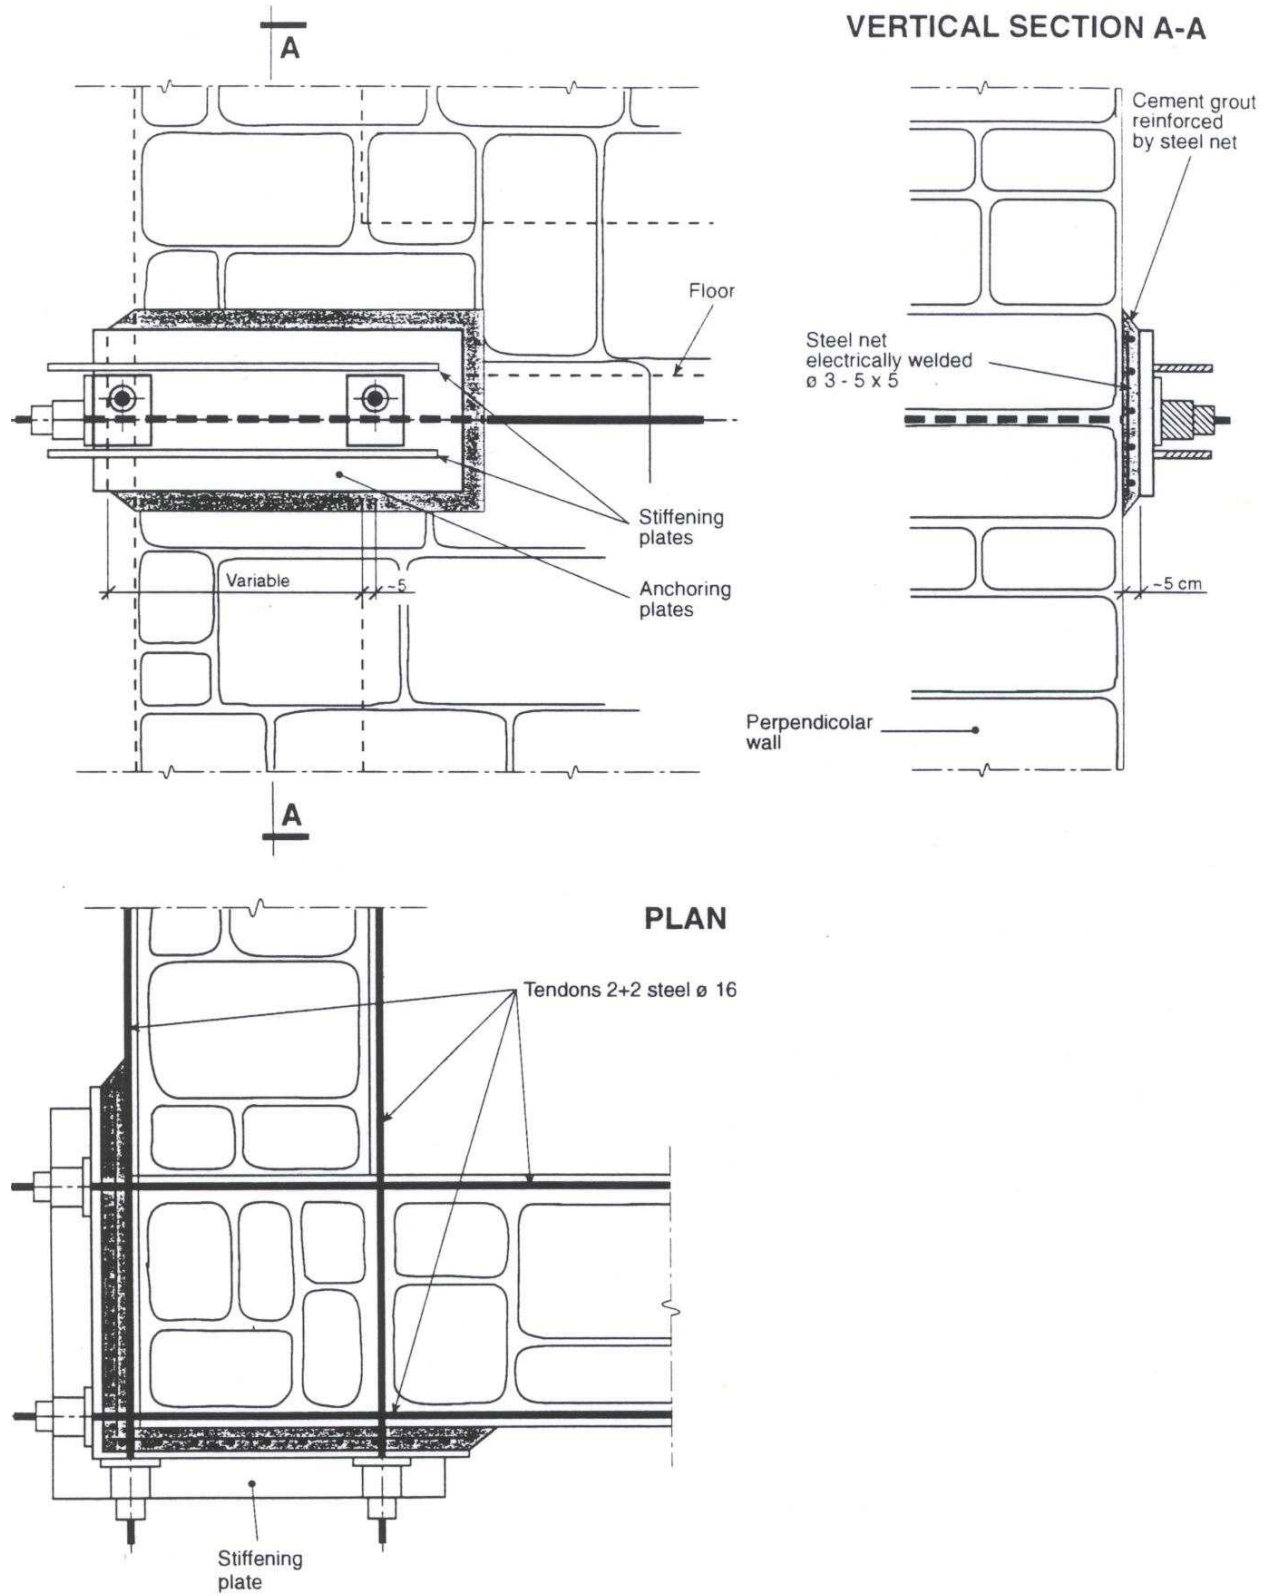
D: Seismic Strengthening : Wall-to-Floor Anchorage
